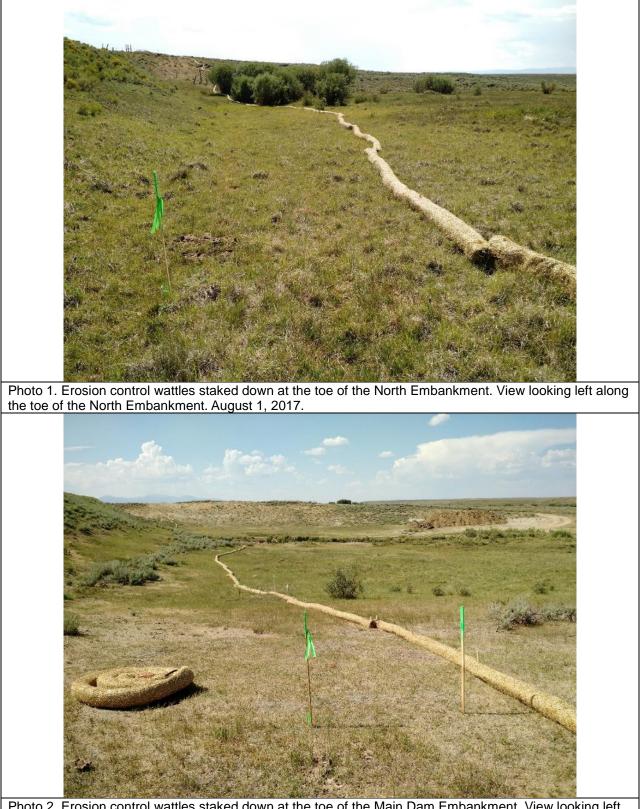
Erosion control wattles staked down at the toe of the Main Dam Embankment. View looking left along the toe of the Main Dam Embankment. August 1, 2017.
